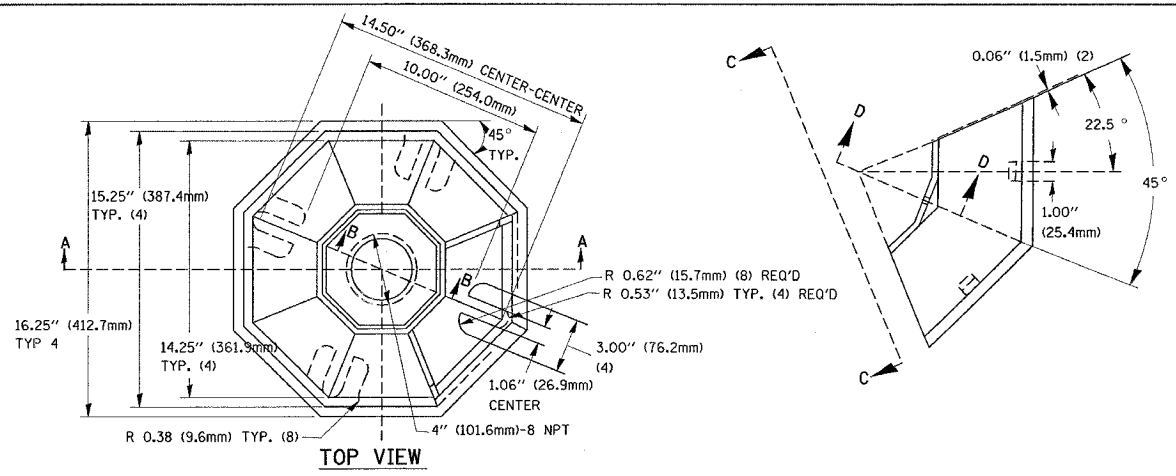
DETAIL HANDHOLE TO INTERCEPT EXISTING CONDUIT N.T.S.
